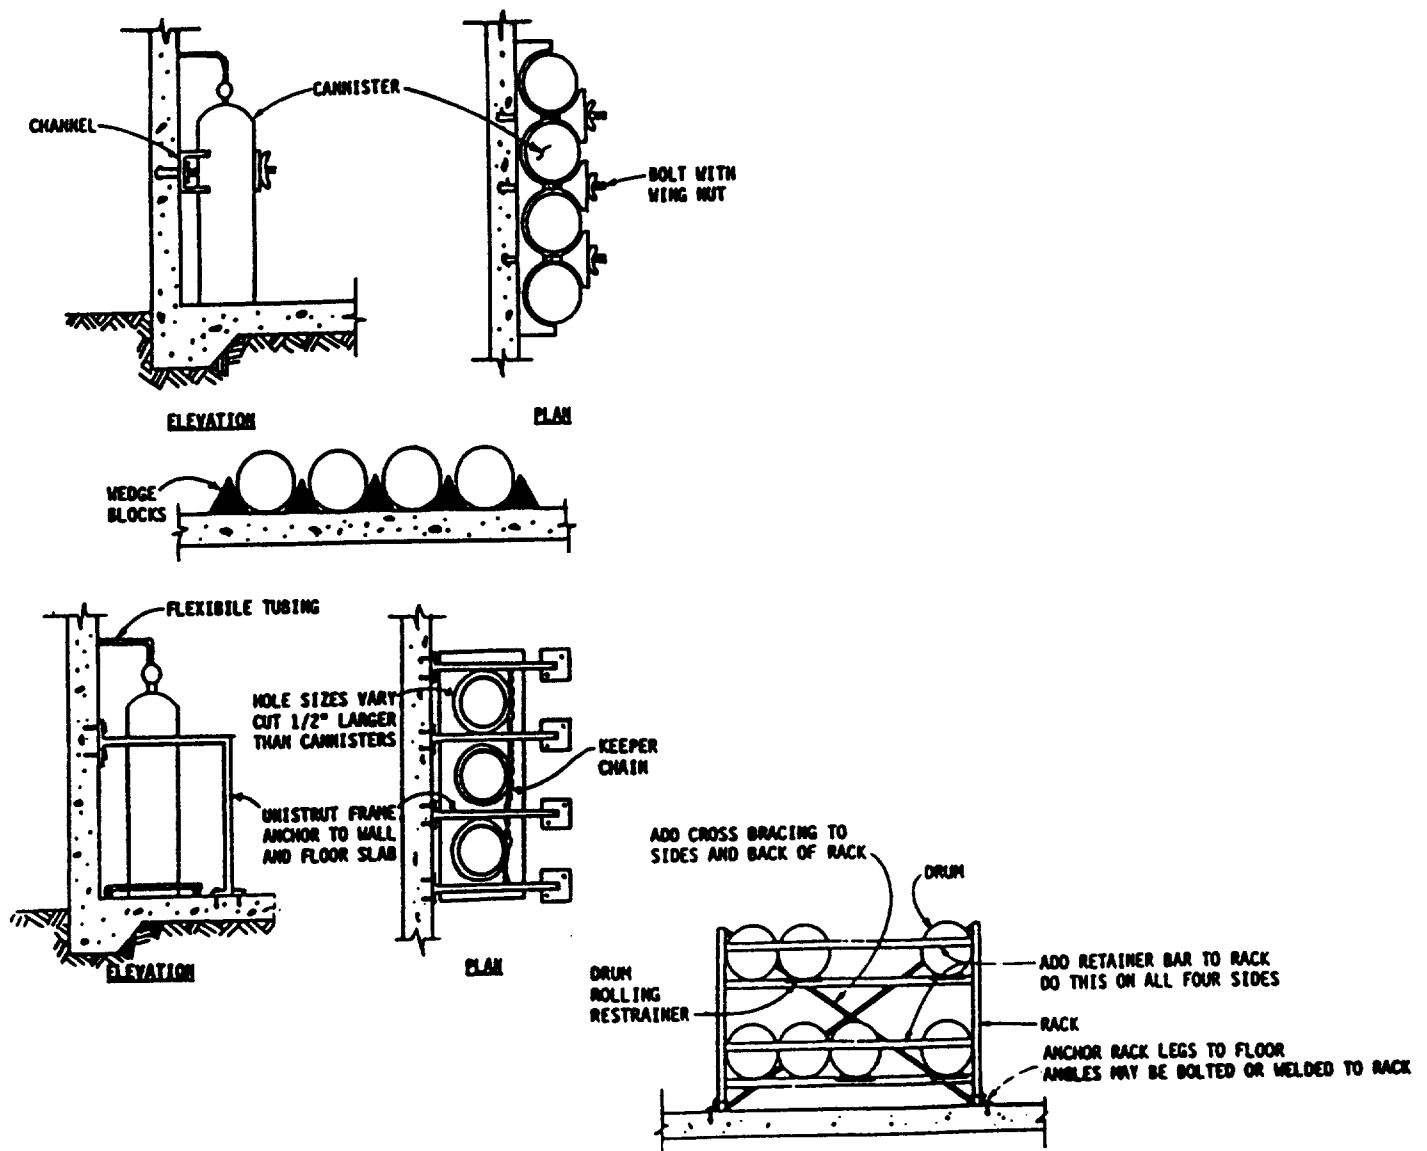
Approaches for Anchoring Canisters (Figure 4-56 of Reference 60)
